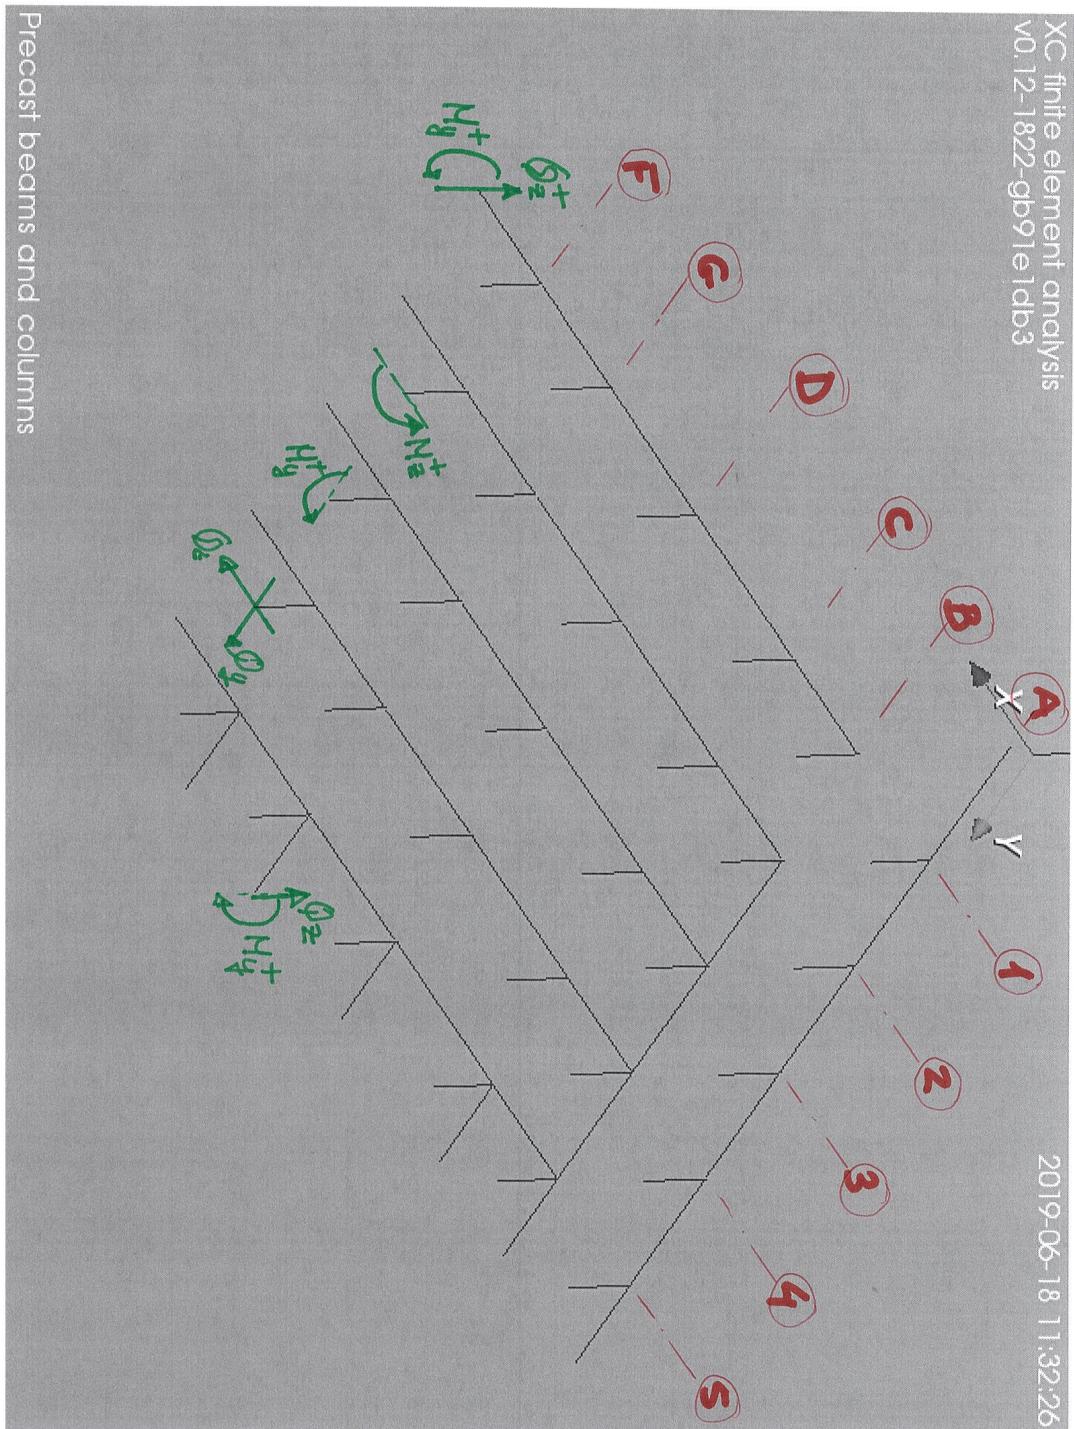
Precast beams and columns. Model layout and internal forces sign convention
